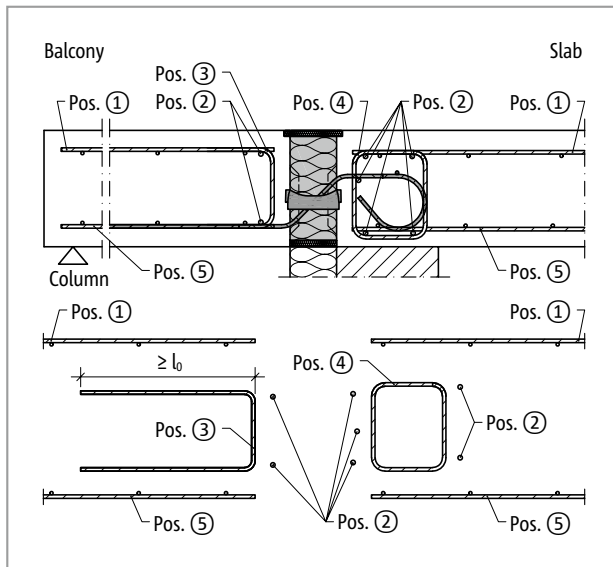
Schöck Isokorb® T type Q-V1 up to Q-V5: On-site reinforcement
